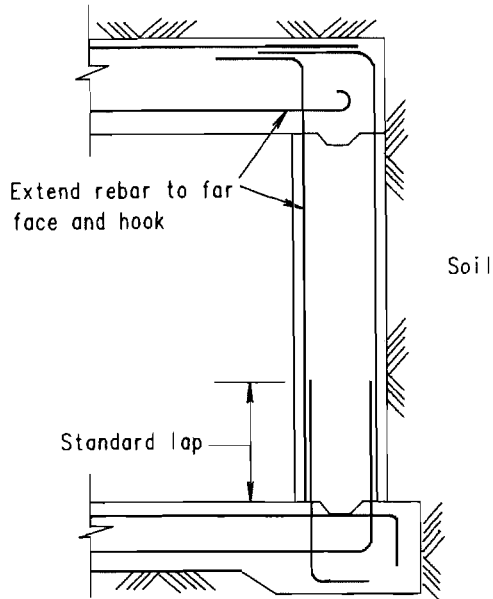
Corner reinforcement for rectangular tunnels in soil.
